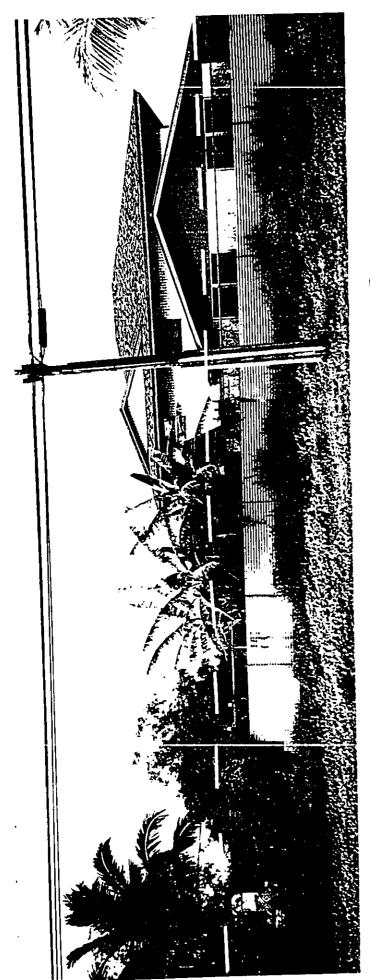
Superimposed Proposed Top of Wall Line, Puunene Avenue Frontage
